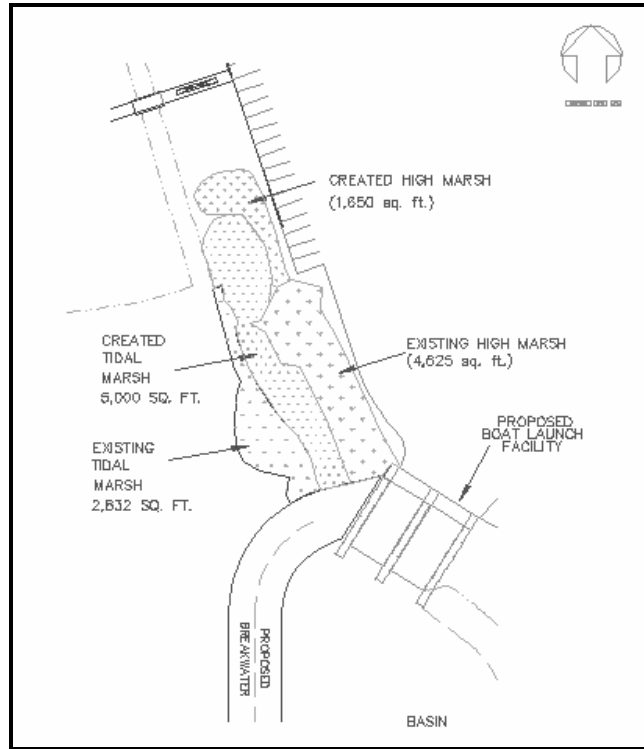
Courthouse Road Improvements Marsh Plan Detail
